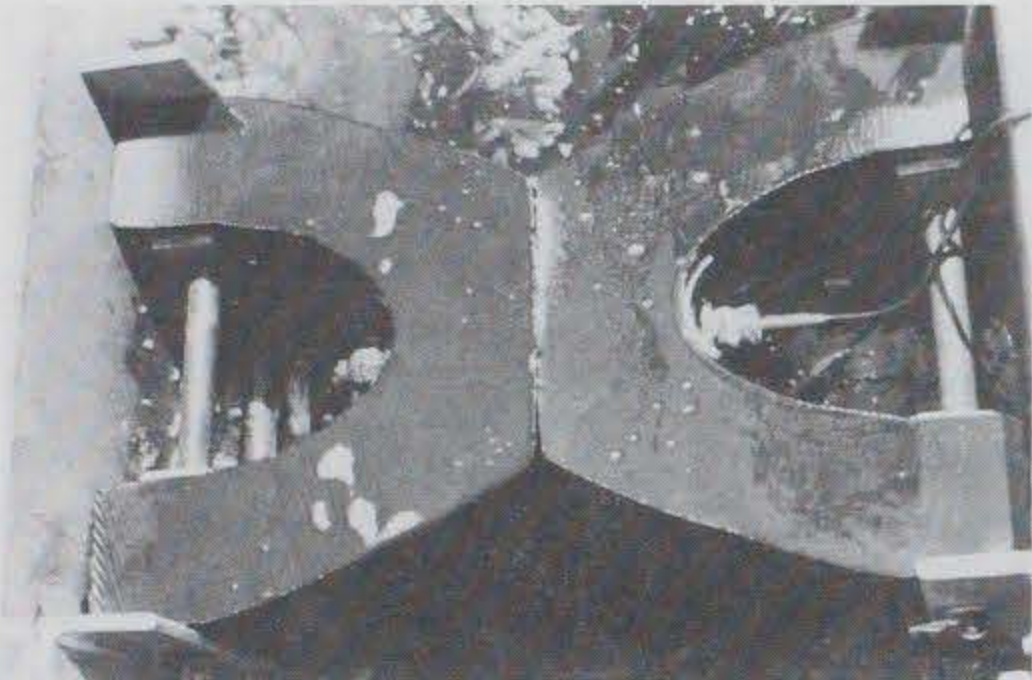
Photo depicting load sensing bolt in vertical fender connection.
